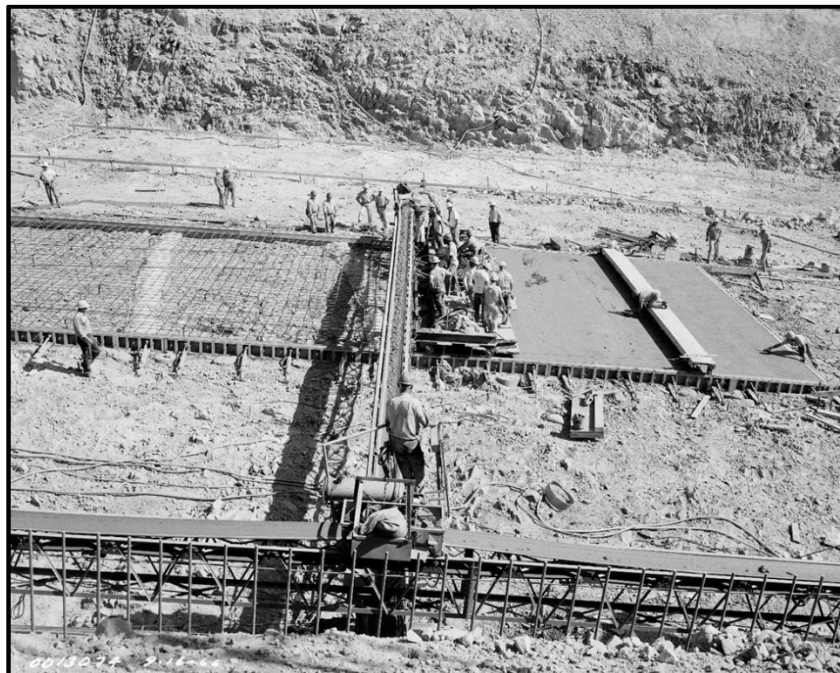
Slip-form chute slab placement (Photo OD_13074_09_16_1966) [8]
